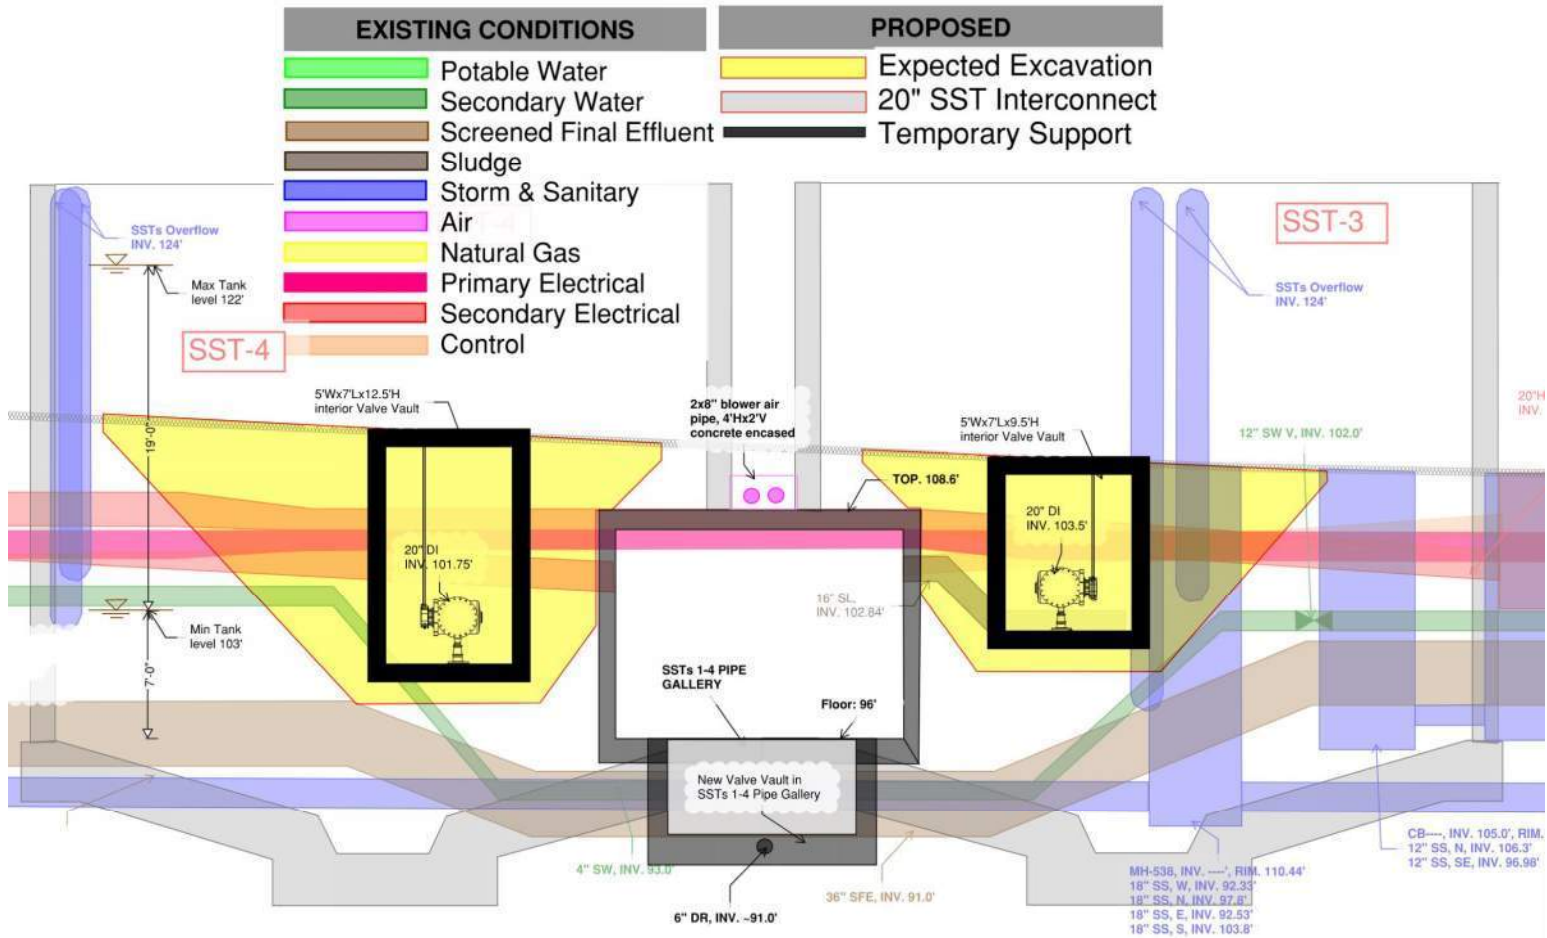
Proposed Tank Interconnections Considering Constructability (Section View)
